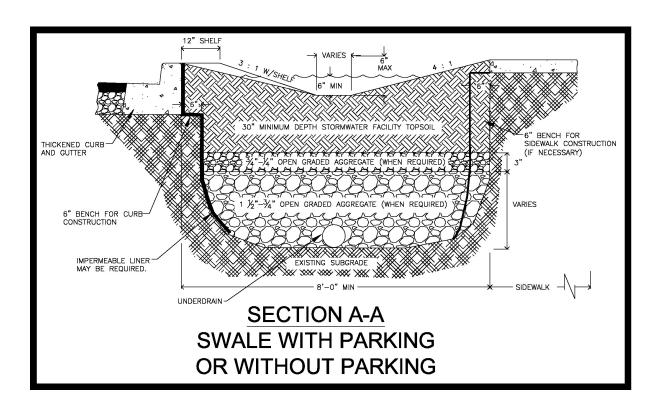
Green Streets Swale Section View (source: Portland, 2011)
